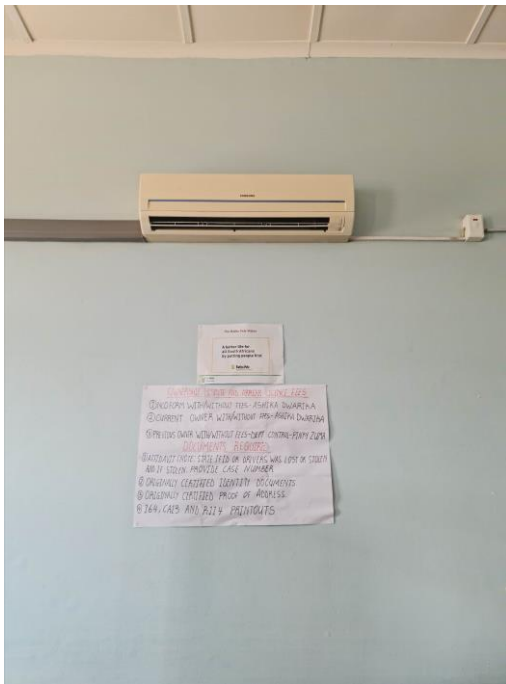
Staff room /office high wall split unit and fresh air supply diffuser installed
